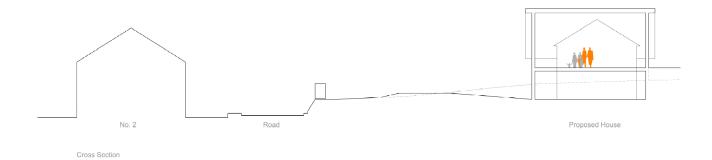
Extract from drawing 16182 PL 008 Cross Section.
